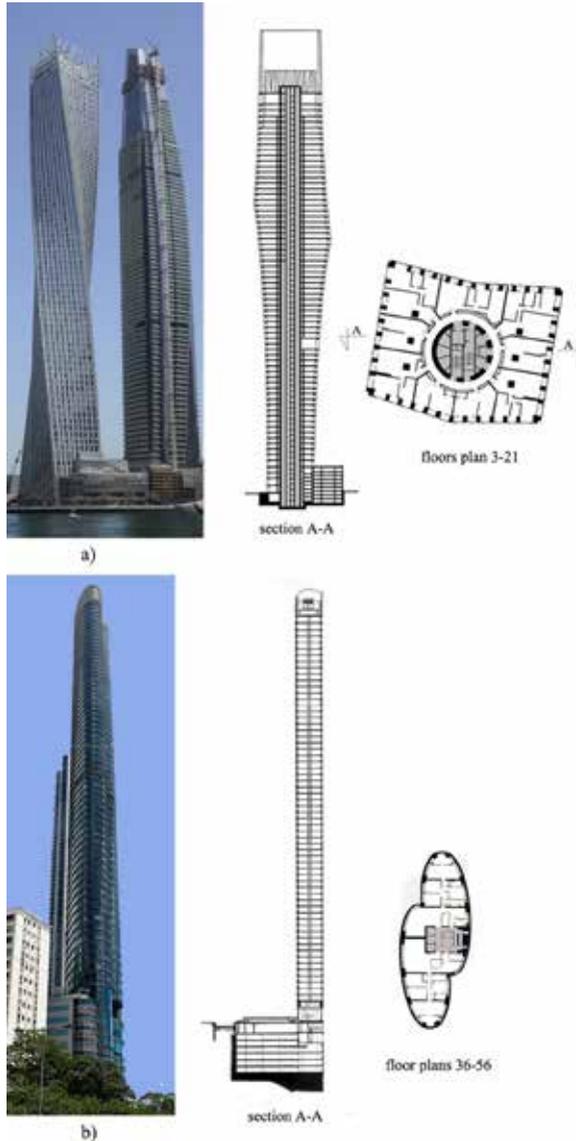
Aerodynamic changing of plan geometry of residential buildings: a) Cayan Tower (Dubai, UAE); b) HighCliff (Hong Kong, China) (developed by authors)
